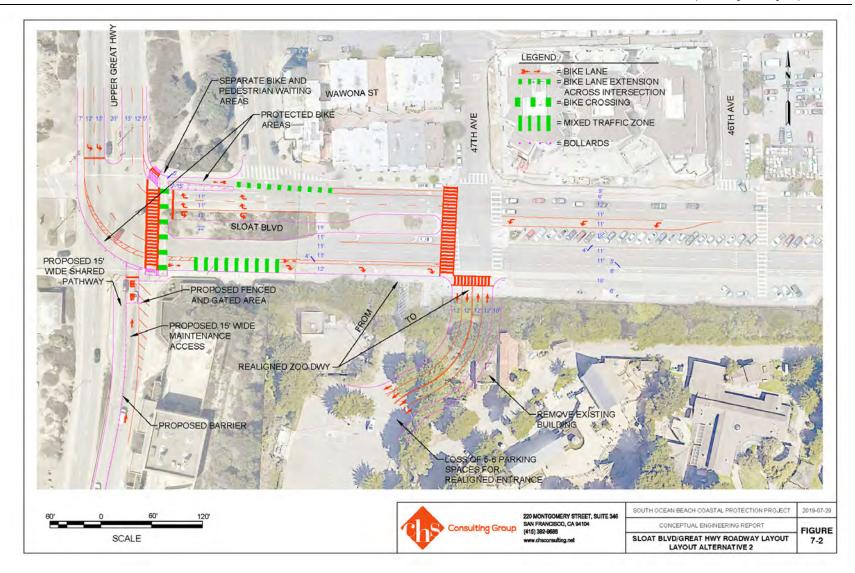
Great Highway at Sloat Boulevard Intersection – Alternative 2
